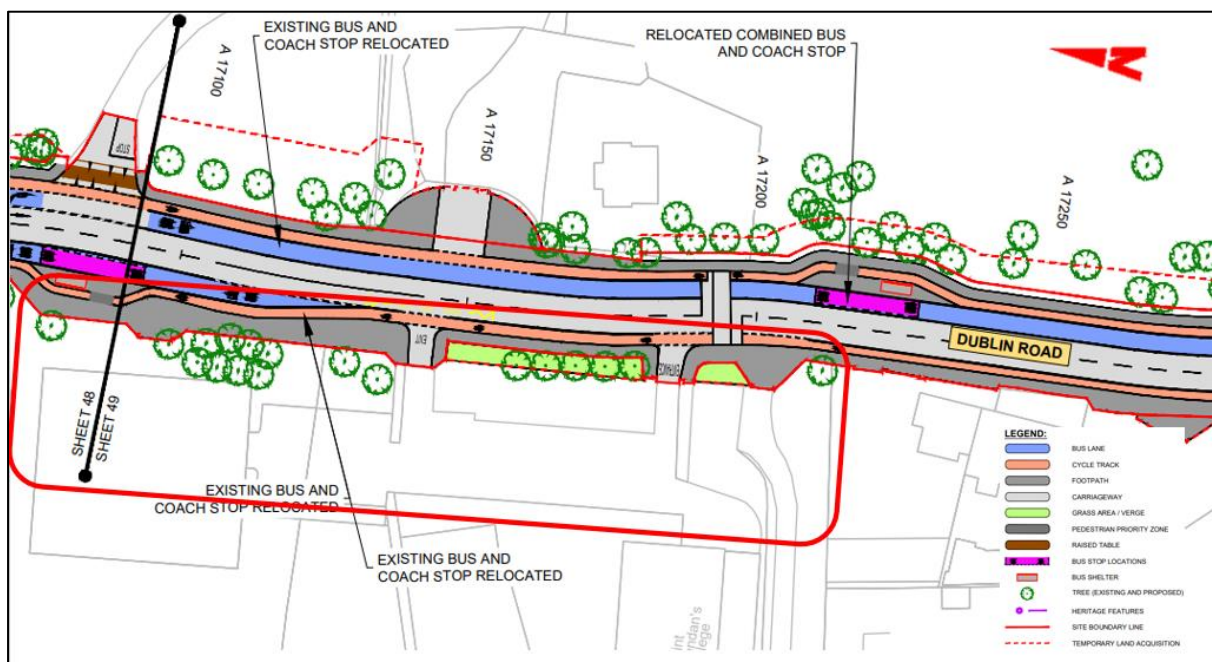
Extract from General Arrangement Drawing at Dublin Road (Sheet 49)
